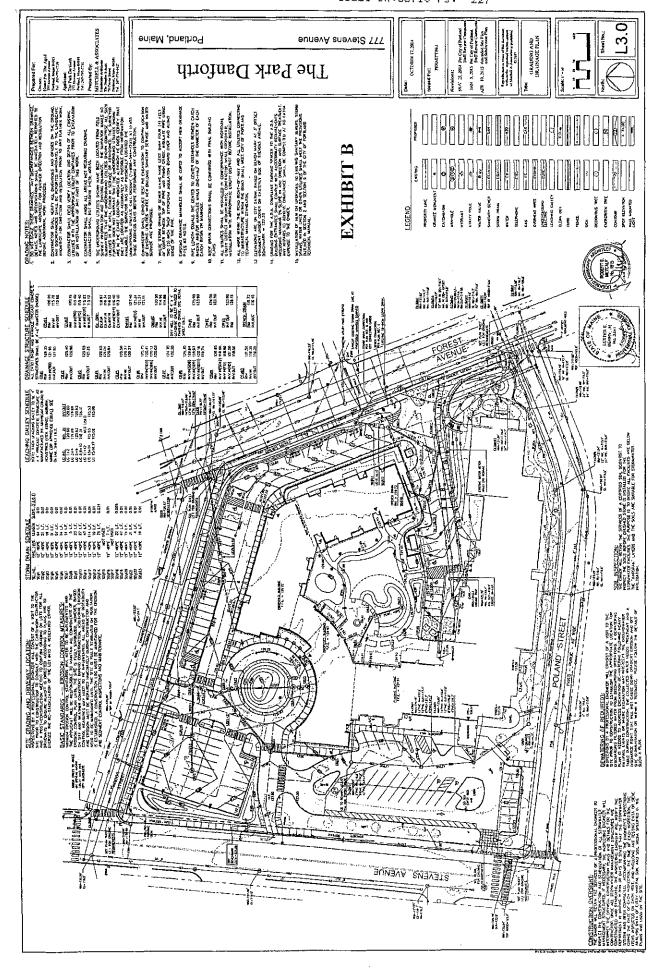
Exhibit B: Approved Grading and Drainage Plan Sheet L3.0
